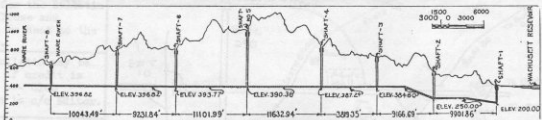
COLDBROOK-WACHUSETT TUNNEL
